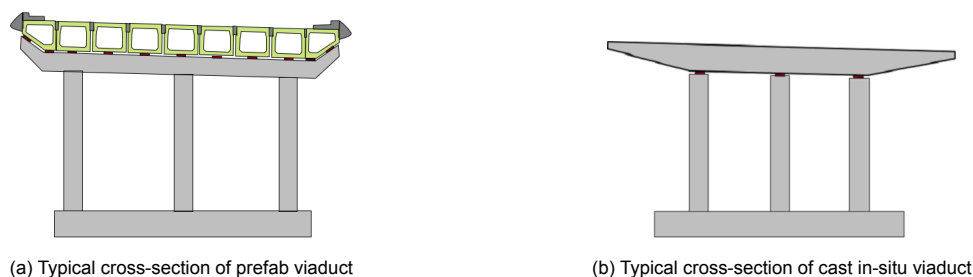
Typical cross-sections of prefab and cast in-situ viaducts with transversal inclination [65] (NB: Note that the clearance height under both viaducts is equal, which results in a larger total height of the prefab viaduct)
